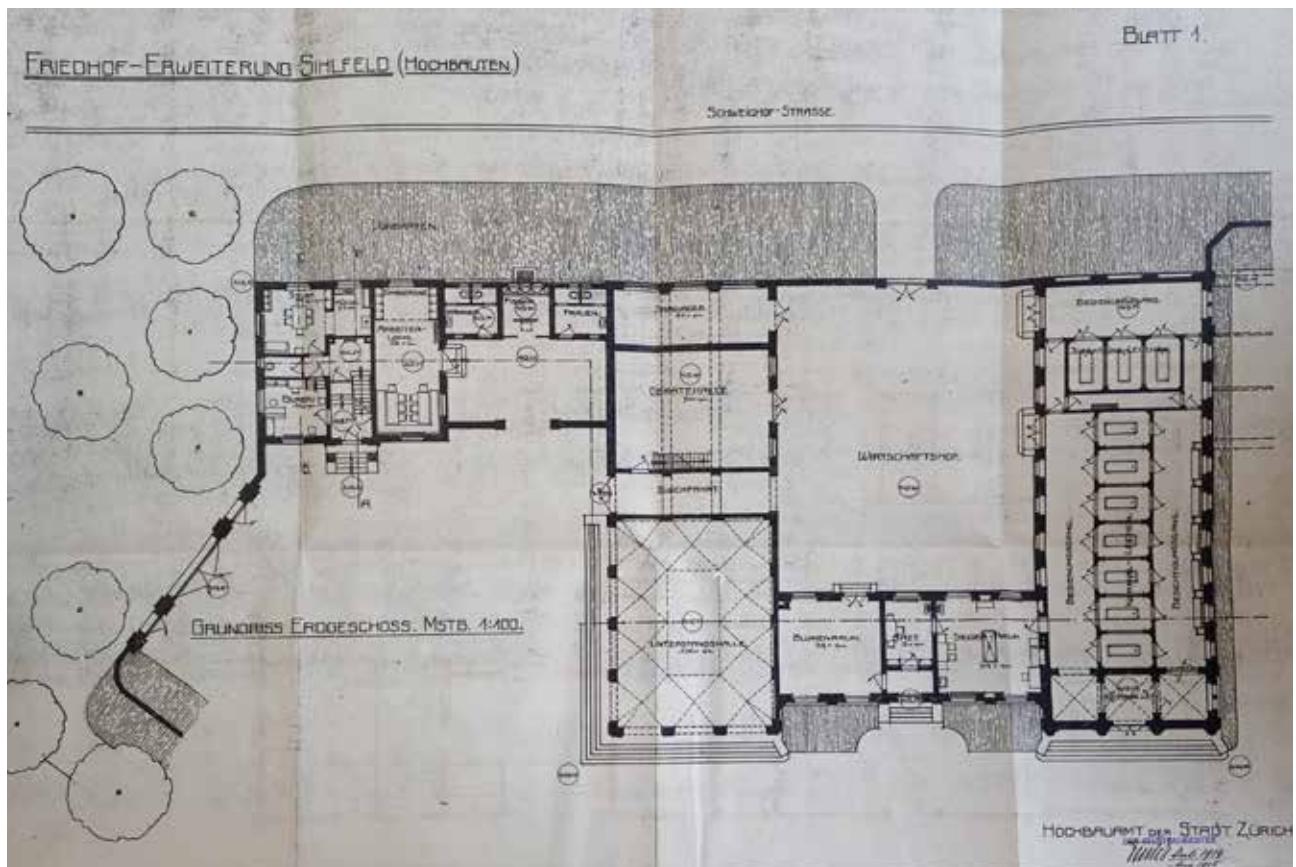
New Administration Plans. Archive Stadt Zürich (1914/15). [Plans]
